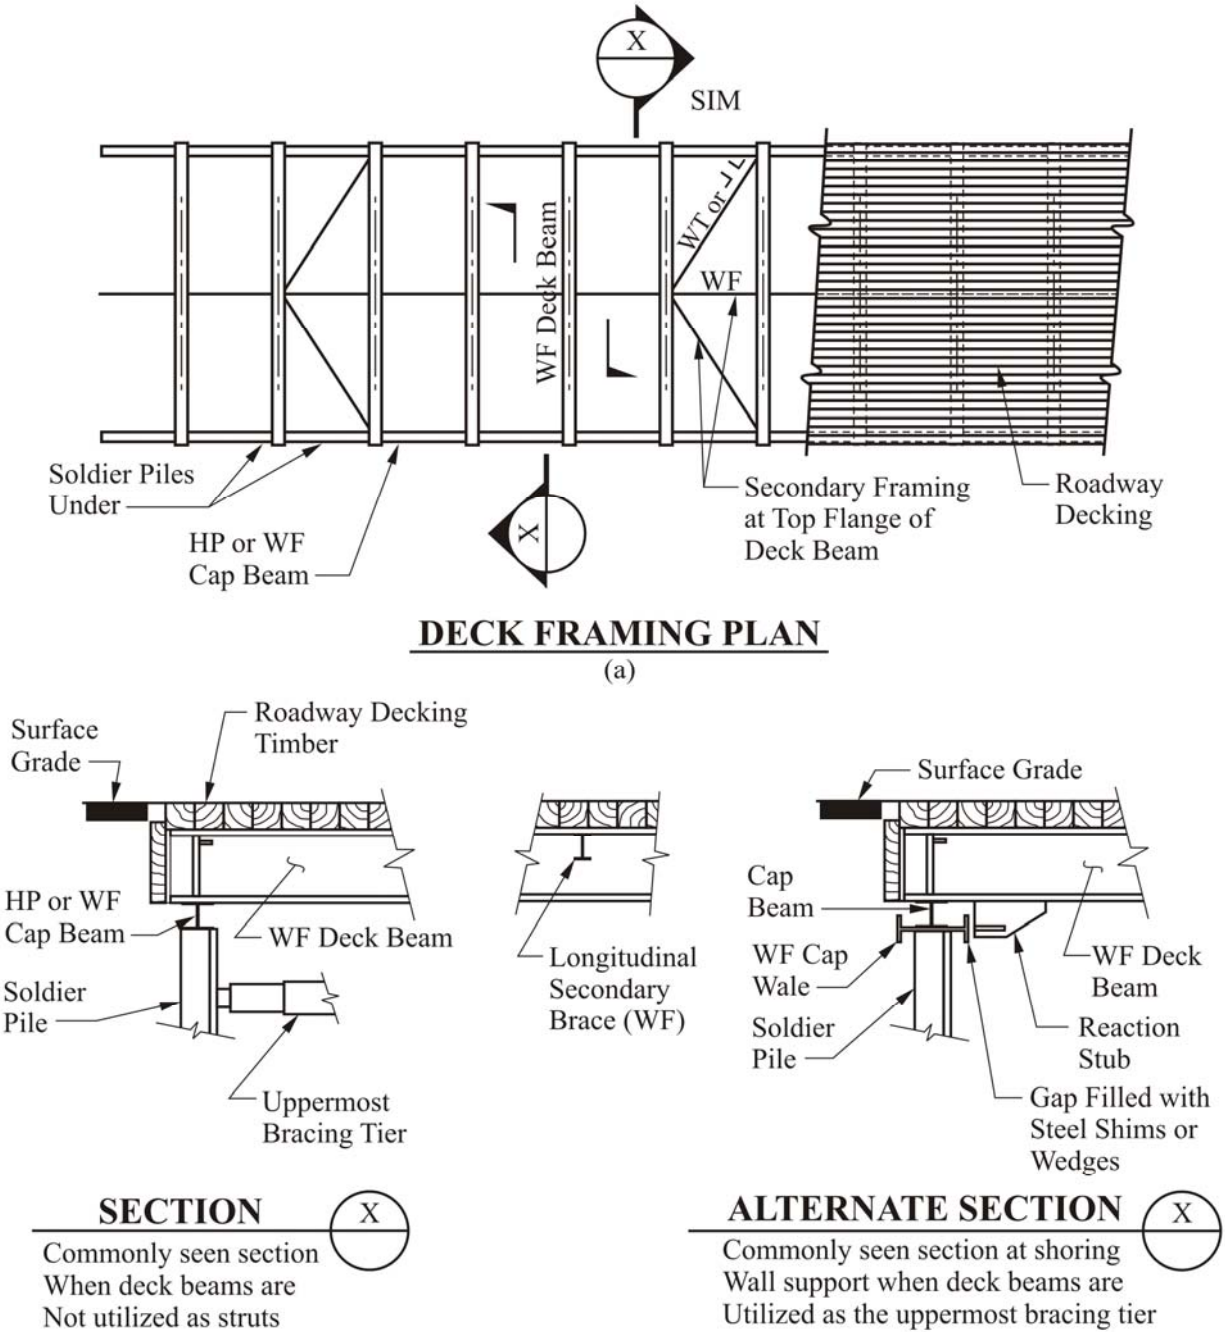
Typical Street Decking (After Bickel et al., 1996)
